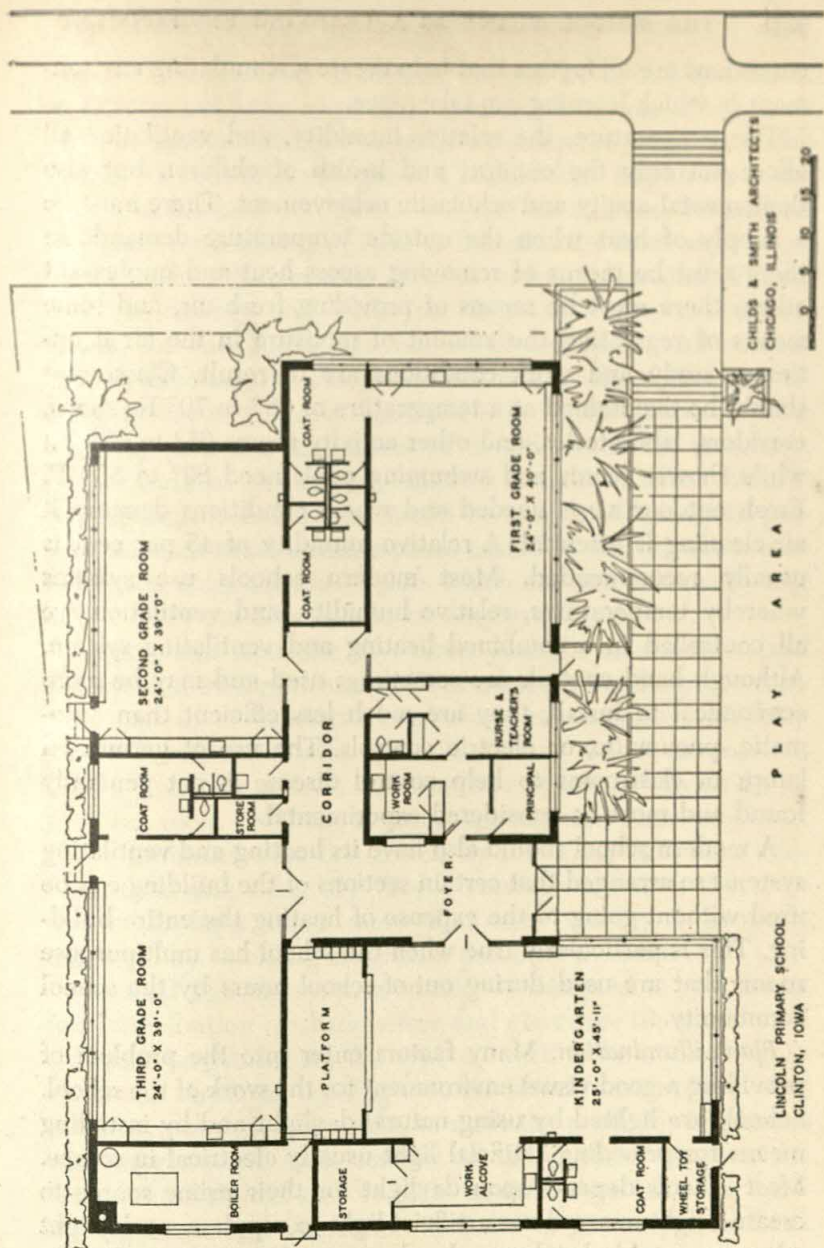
Floor Plan of Lincoln Primary School, Clinton, Iowa.
